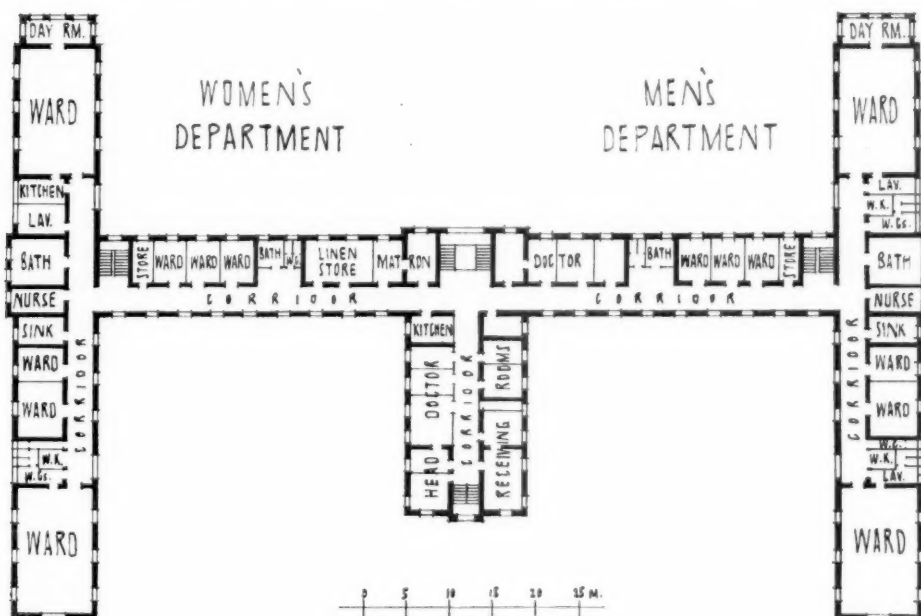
OFFENBACH MUNICIPAL HOSPITAL: FIRST FLOOR PLAN.
